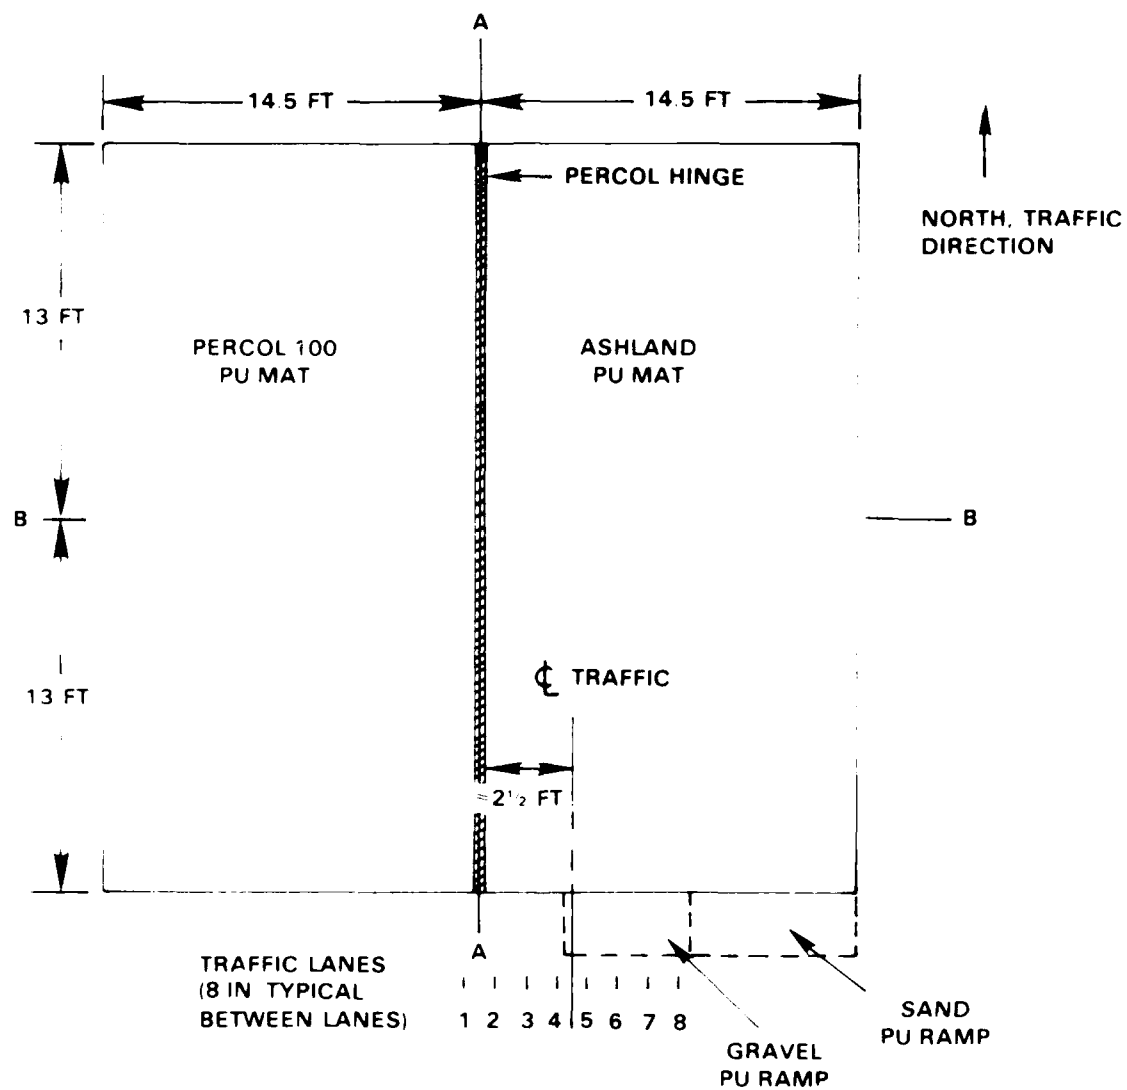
Test Section Plan View, Wet Crater Repair Demonstration.
